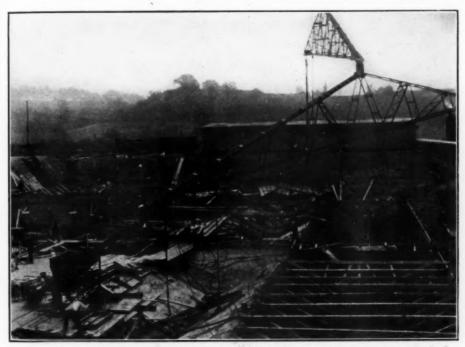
FORMS FOR IMHOFF TANK BOTTOM IN PLACE AND POURING UNDER WAY
